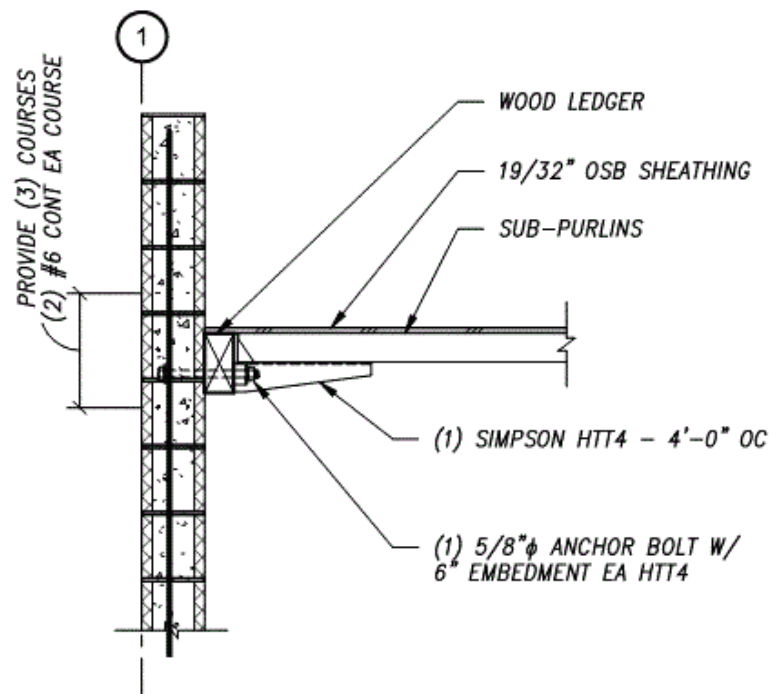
Single-story retail/industrial/warehouse building framing detail.
